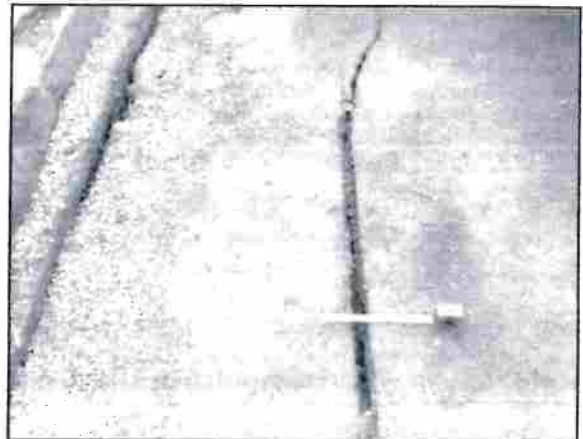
Typical crack in the pavement as a result of settlement of the soil below.
